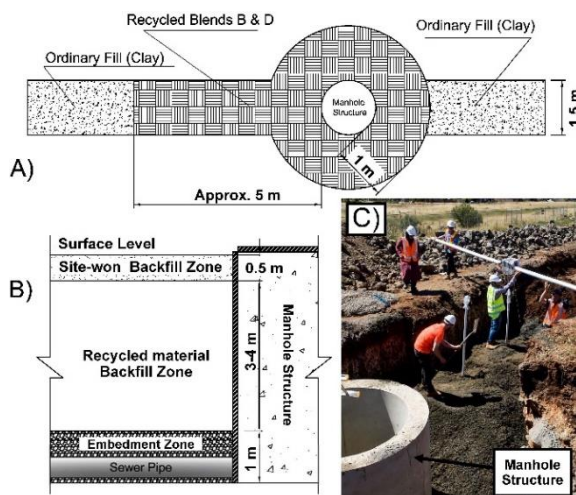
Schematic (a) plan & (b) elevation view of the trial site and (c) installation of moisture sensors and settlement plates in the trench
